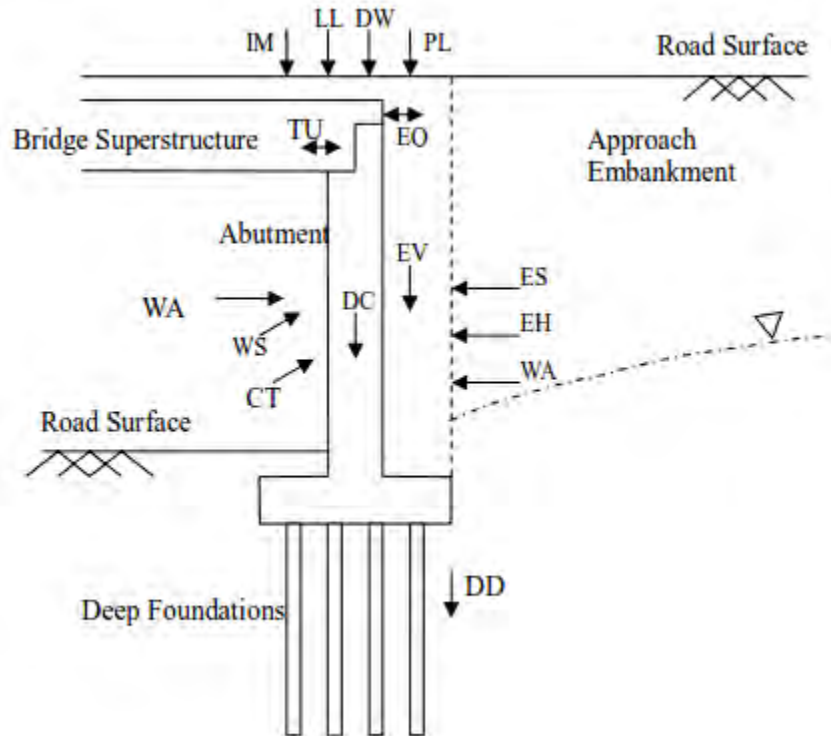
Typical loads in bridge abutments supported on deep foundations.
